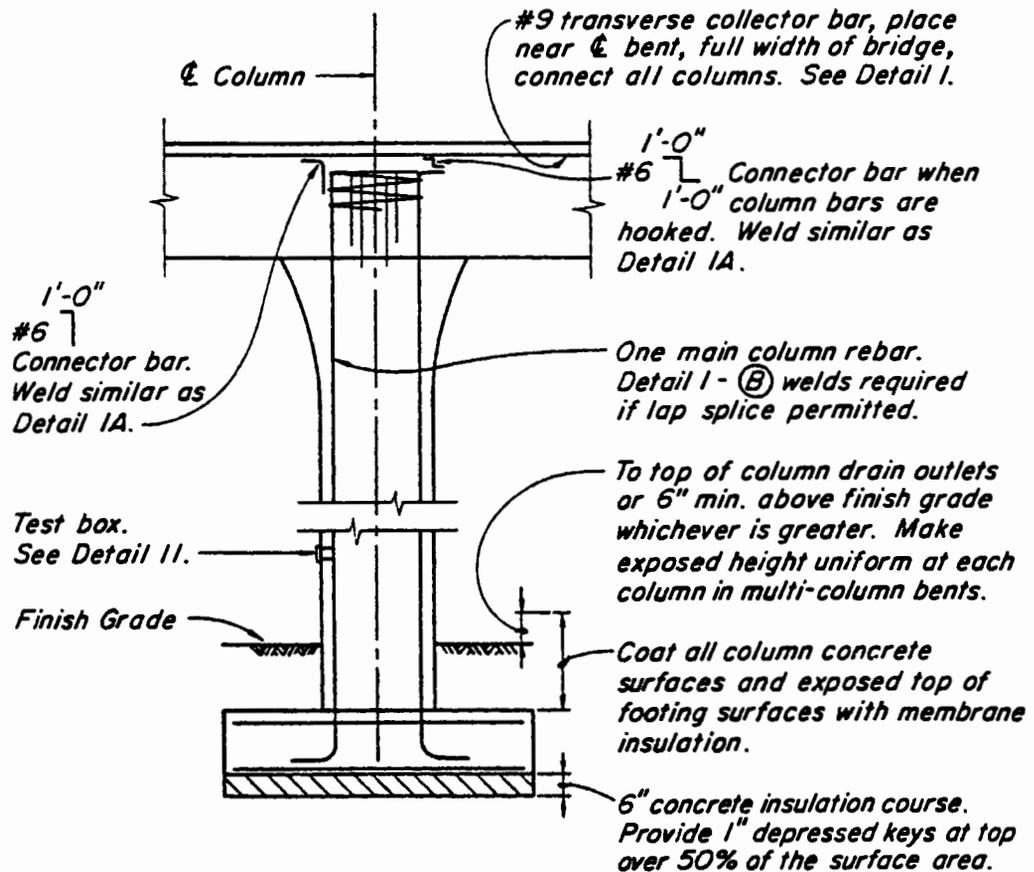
HINGED COLUMN DETAILS w/FOOTING
